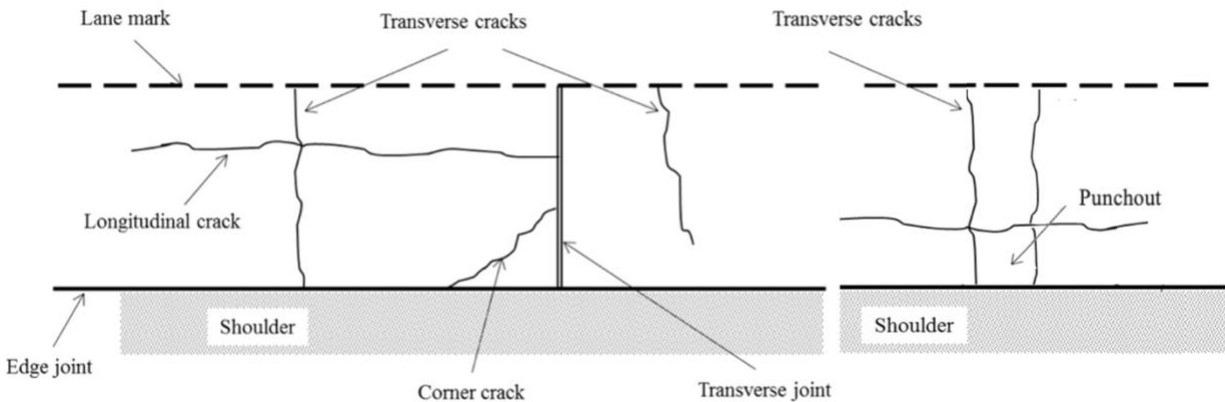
Types of fatigue cracking in concrete pavements
